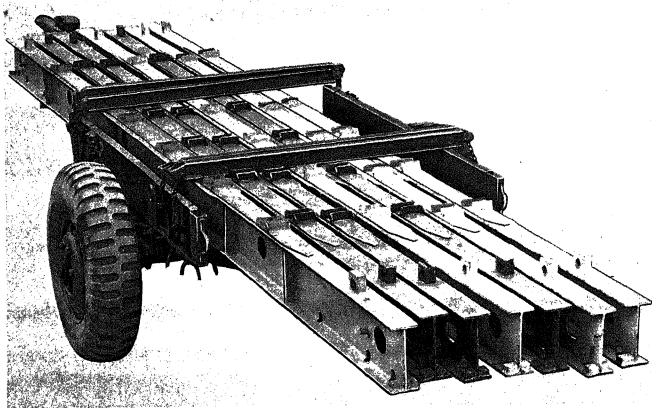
Trailer load No. 4—Transom load on 2 1/2-ton pole type trailer.
